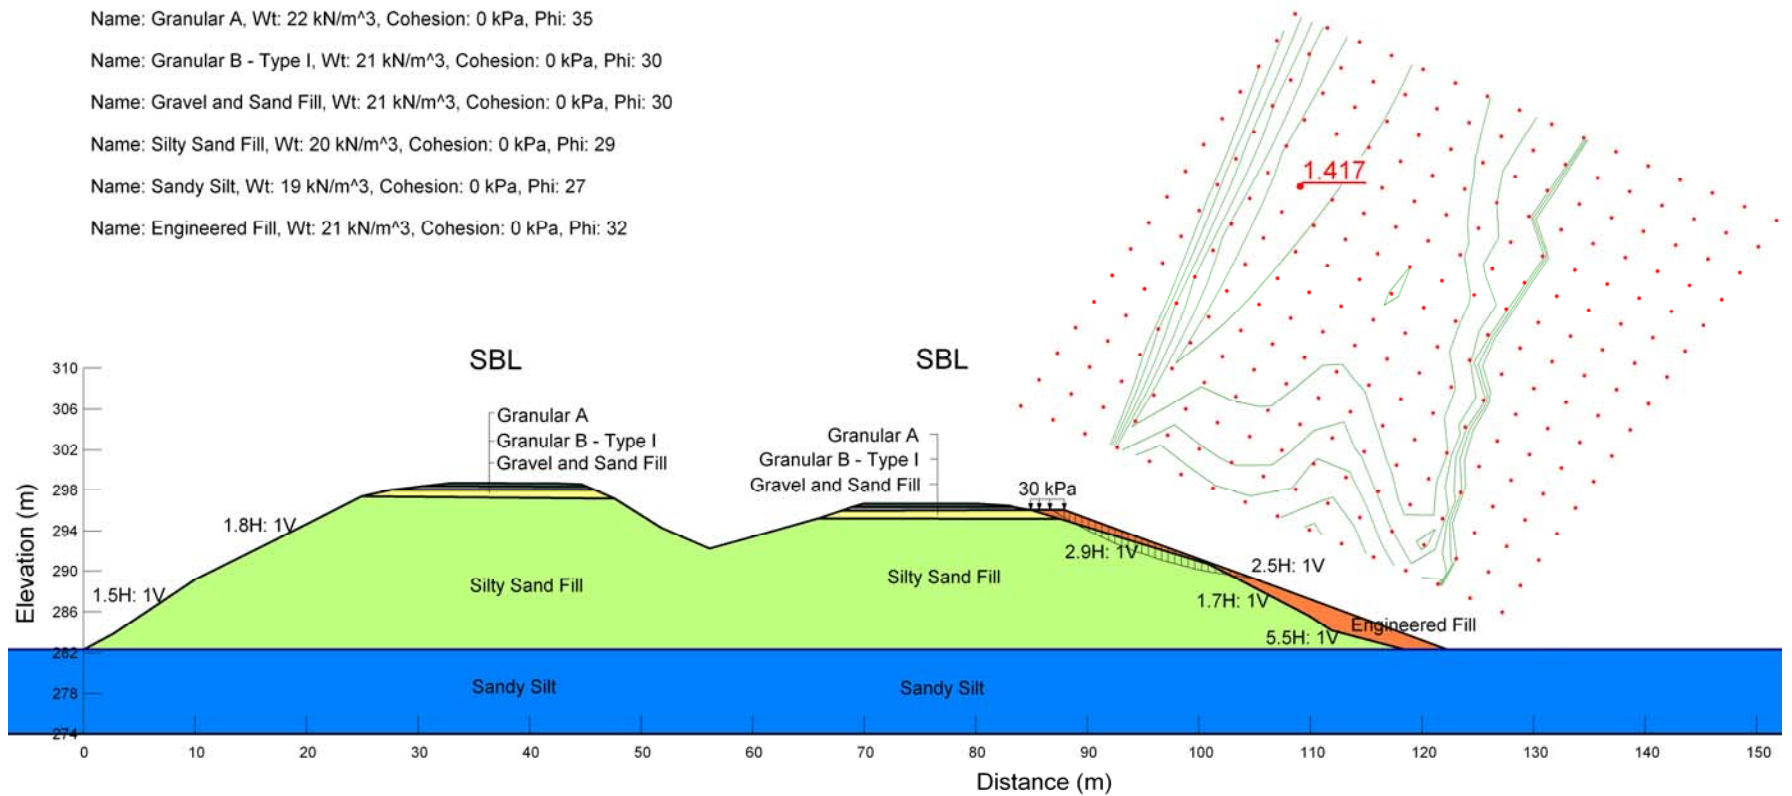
F-D. Results of Slope Stability Analyses on Construction Access Ramp with 2.5H:1V\_Highway 11\_ East Side Slope
